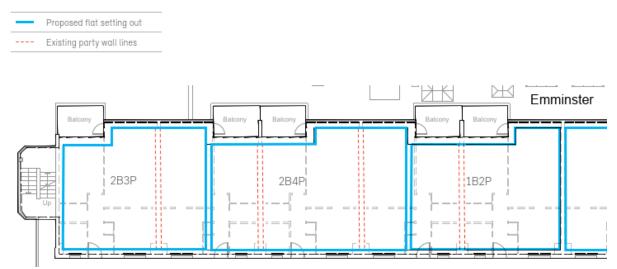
Emminster (existing block on site) floor plan showing flats combined into a mix of homes
